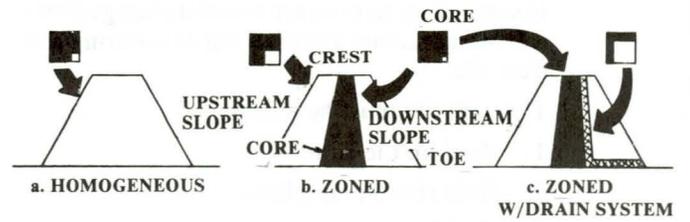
TYPICAL CROSS SECTIONS
